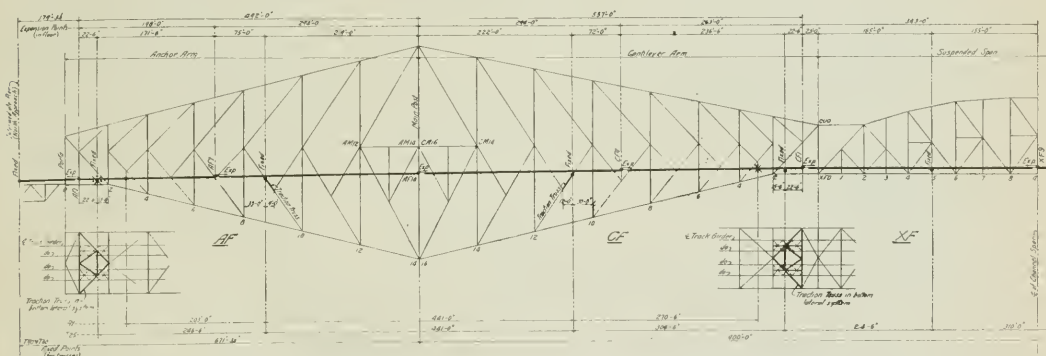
Elevation of Quebec Bridge Showing Location of Expansion Joints and Traction Trusses for Floor and Truss Systems
